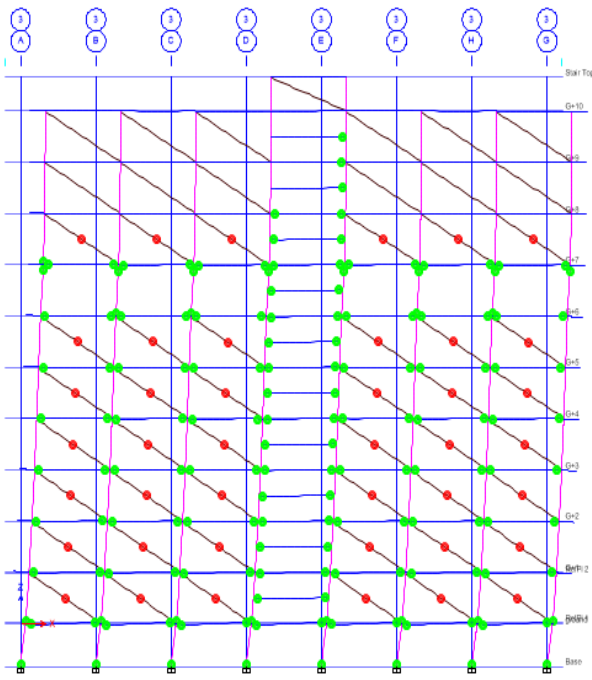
14 Typical failure modes observed for (G+7) plan regular building models
